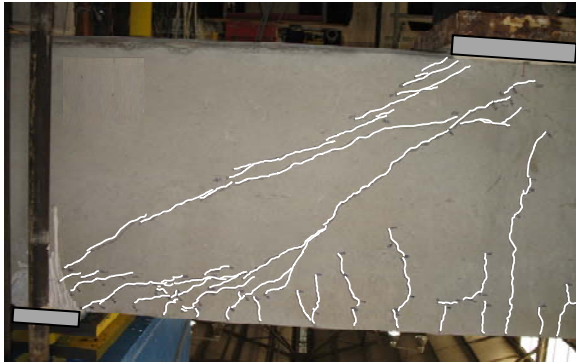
Maximum diagonal crack width for 6 - 21"x42" specimens tested at a/d of 1.85
